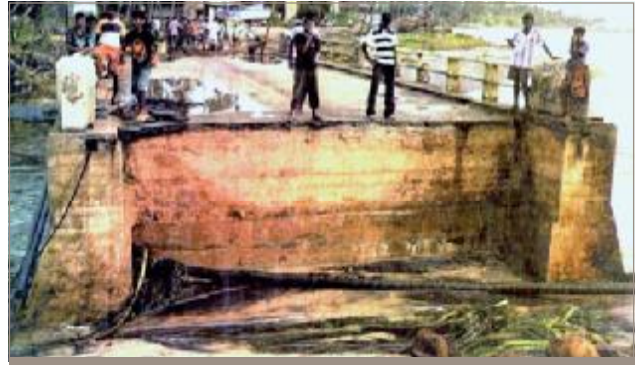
Bridge approach embankments were often more vulnerable than the bridge structures themselves
